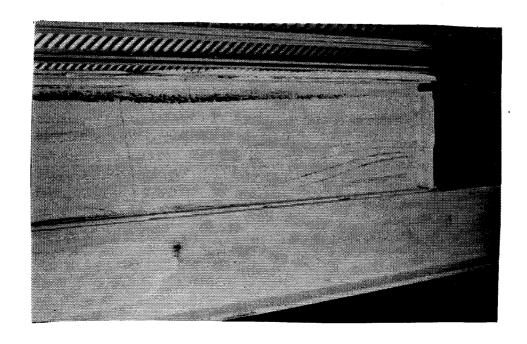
Yield Line Pattern in South Exterior Stub of Full-Size Stub-Girder (Load of 210 kN (47.2 kips)/jack)
